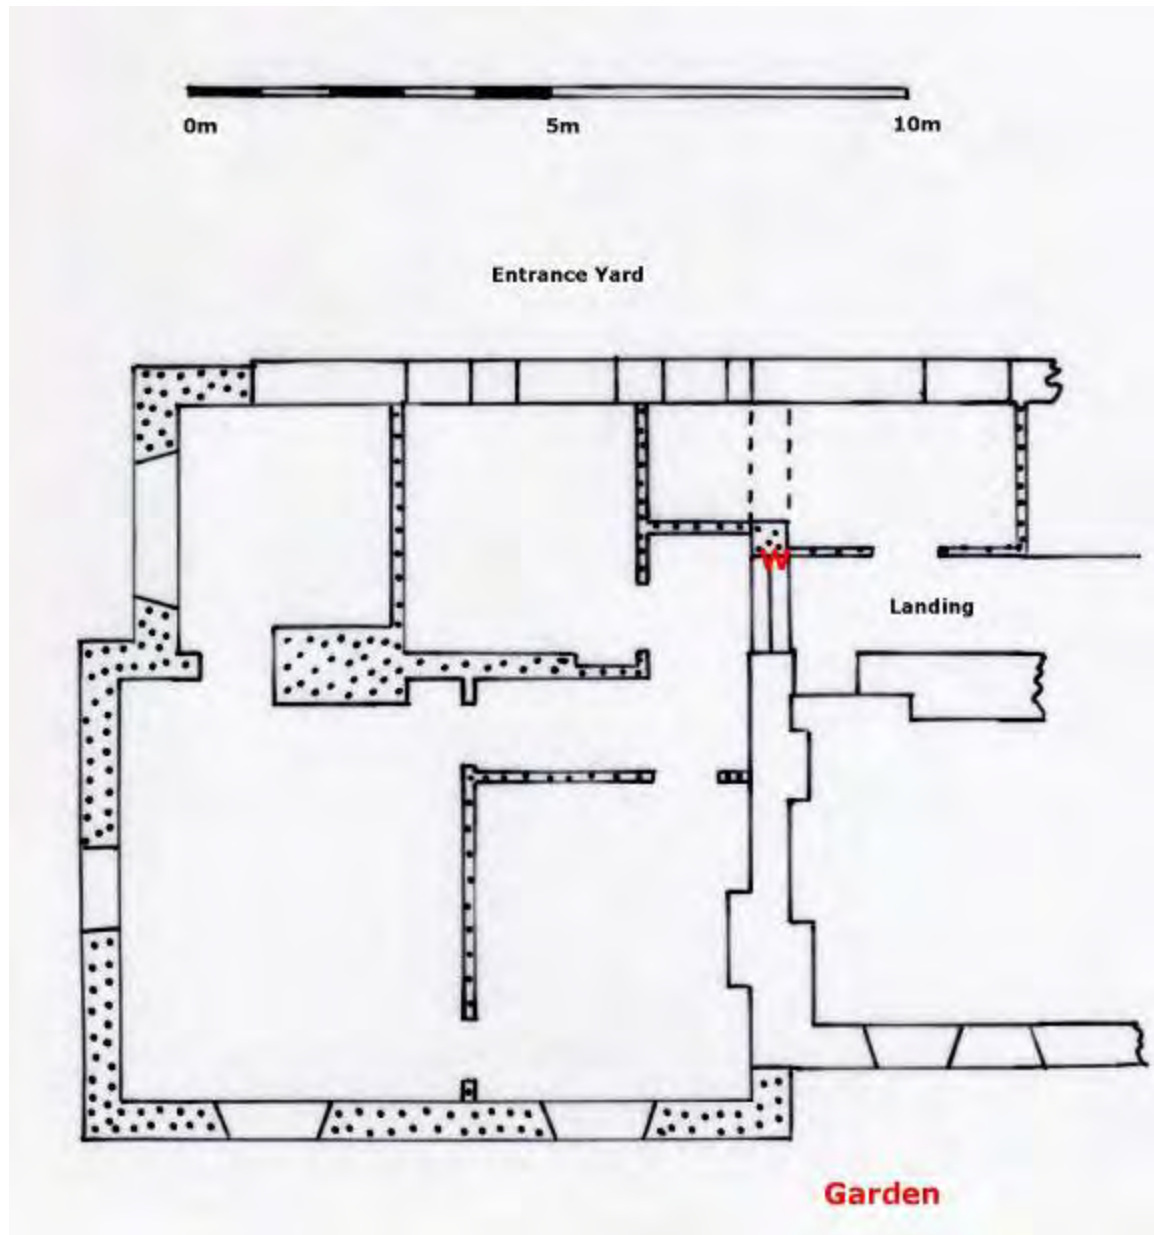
Annotated plan of western end of First Floor showing wallpaper location
